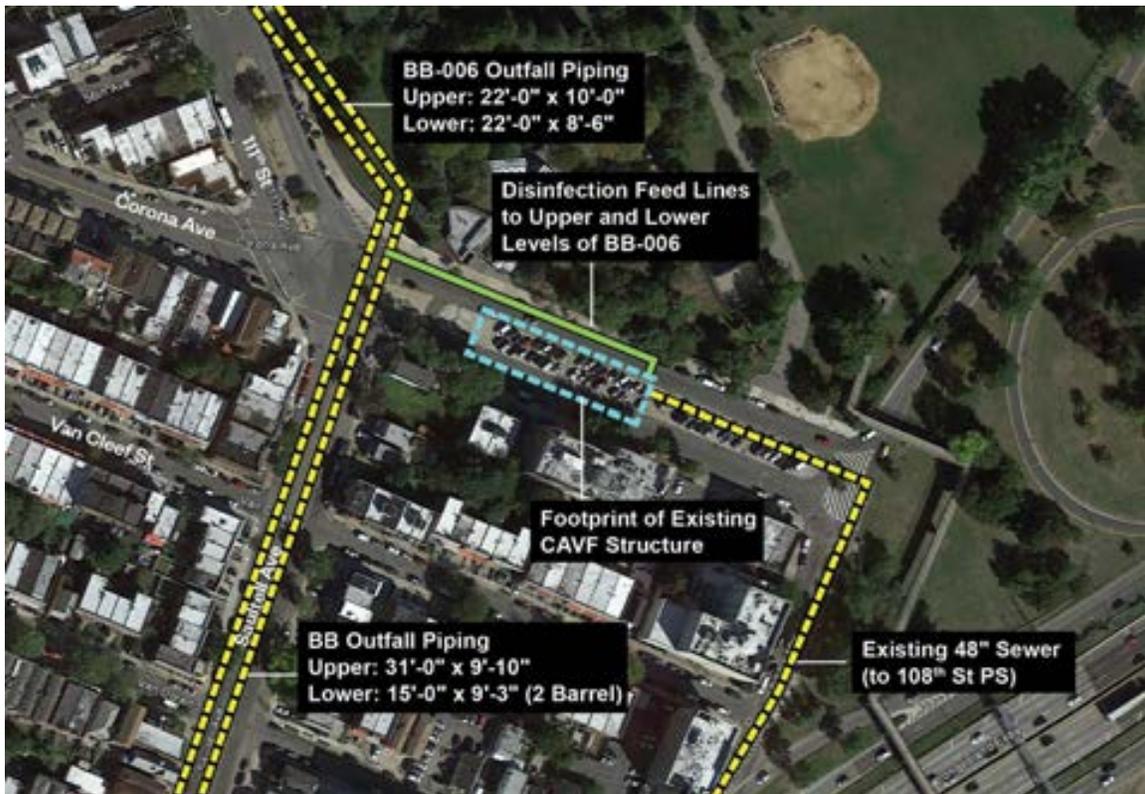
Alternative 9-1 – Retrofit of CAVF for Disinfection of Outfall BB-006
